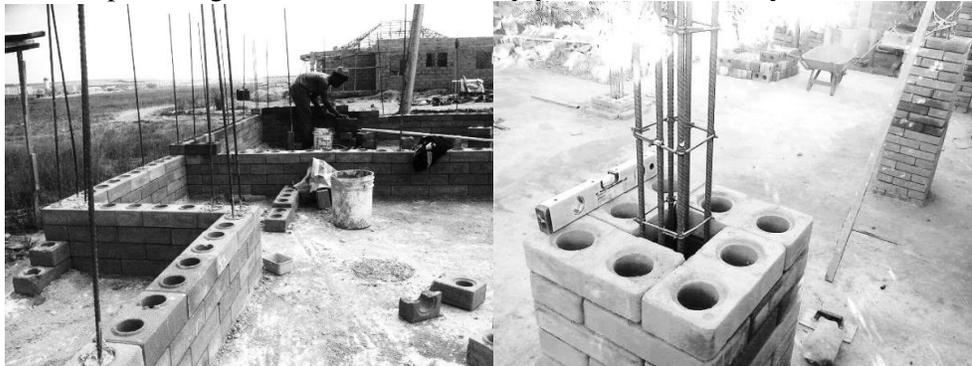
Showing reinforcement in ISSBs Source: Field study
